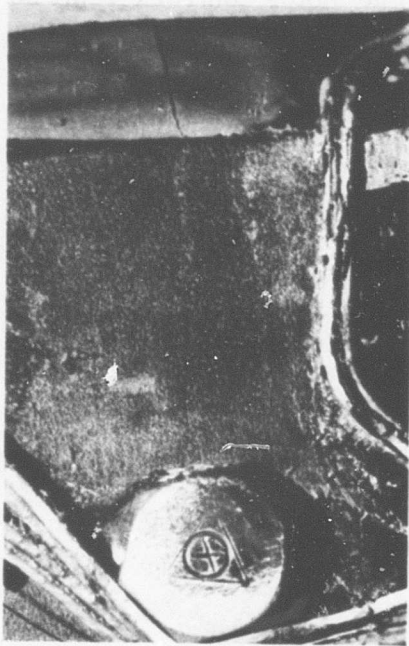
Enlargement of Fatigue Crack Area at Detection.
